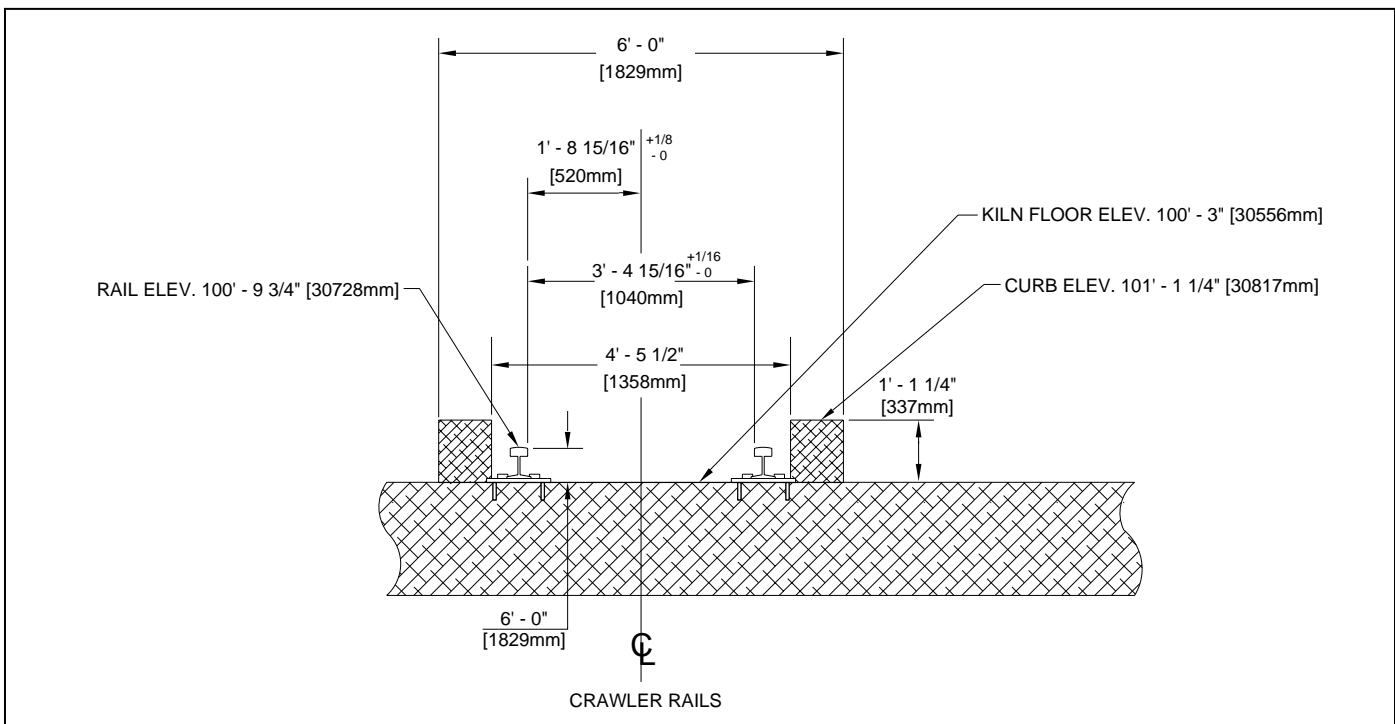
SIDE SHIFTER AND CRAWLER RAIL INSTALLATION.
